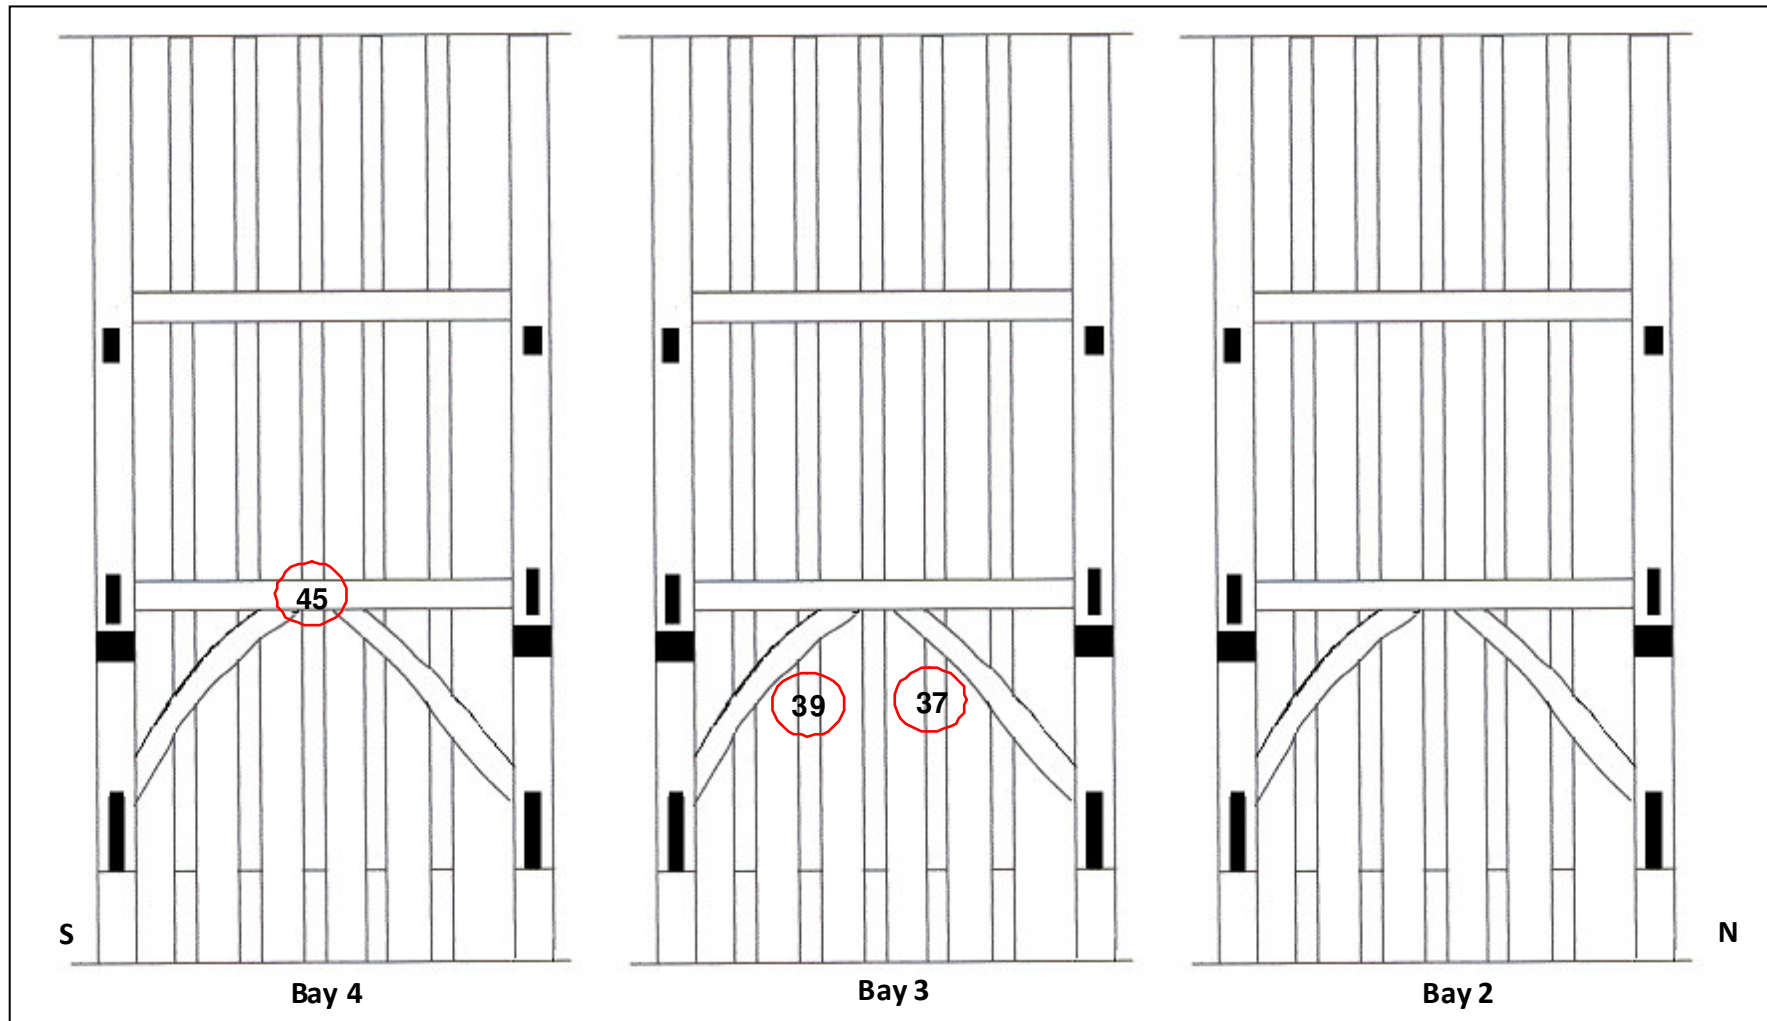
Long-section through north-west transept roof to show sampled timbers (viewed from the east looking west)
